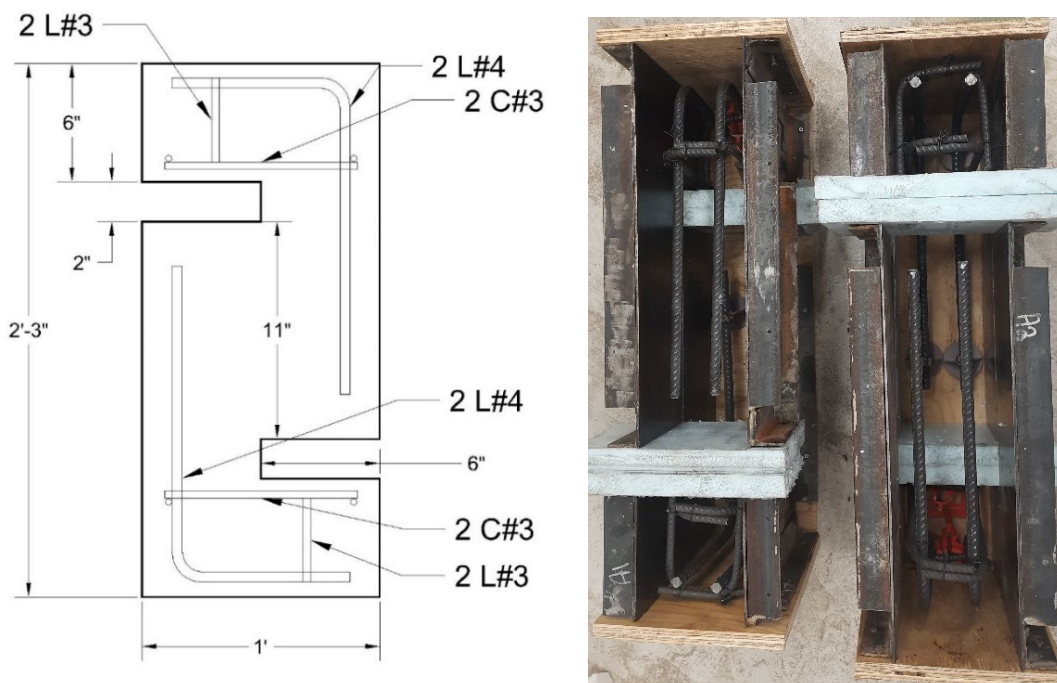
Schematic elevation view of the shear strength test specimen (left) and formwork (right)
